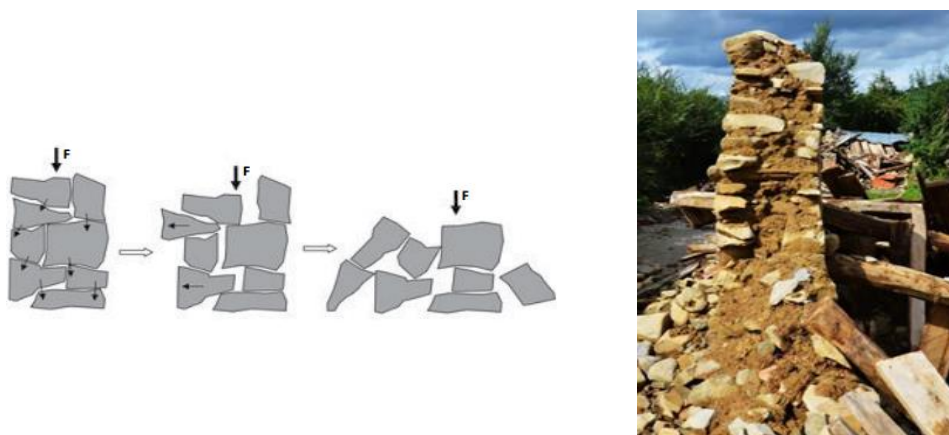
Detail of wall failure caused by irregular stones (Bothara and Hıçyılmaz). On the right, a building collapse due to its poor quality masonry, which included soil mortar
